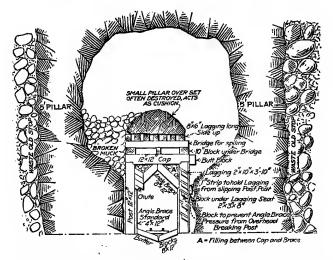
DETAILS OF TIMBER SET AND SECTION OF STOPE OPENED UP IN LOWER PILLAR LEVELS
